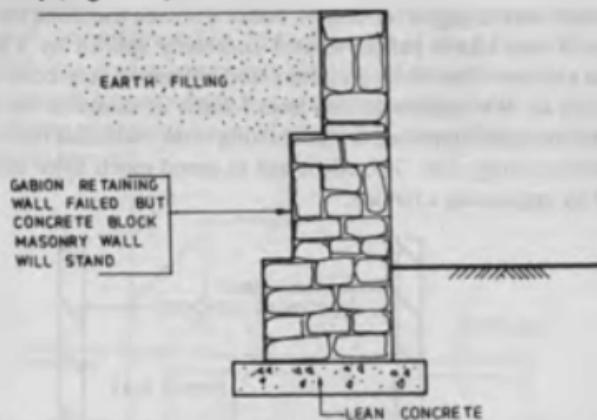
7. Failure of a Gabion retaining wall.
